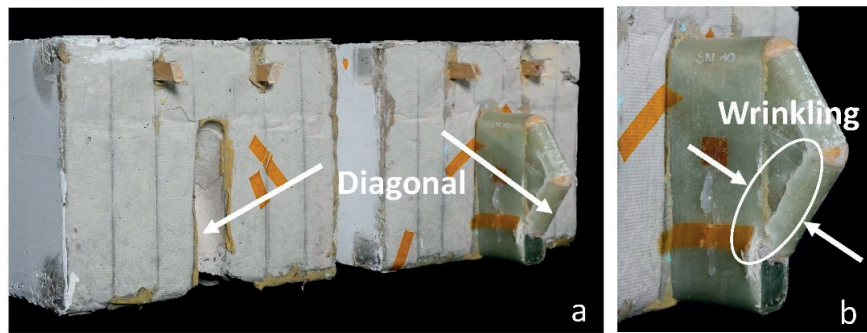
Failure mode of beam G400-1: a) undamaged concrete in interior (left) beam, b) wrinkling of GFRP hexagon diagonal.
